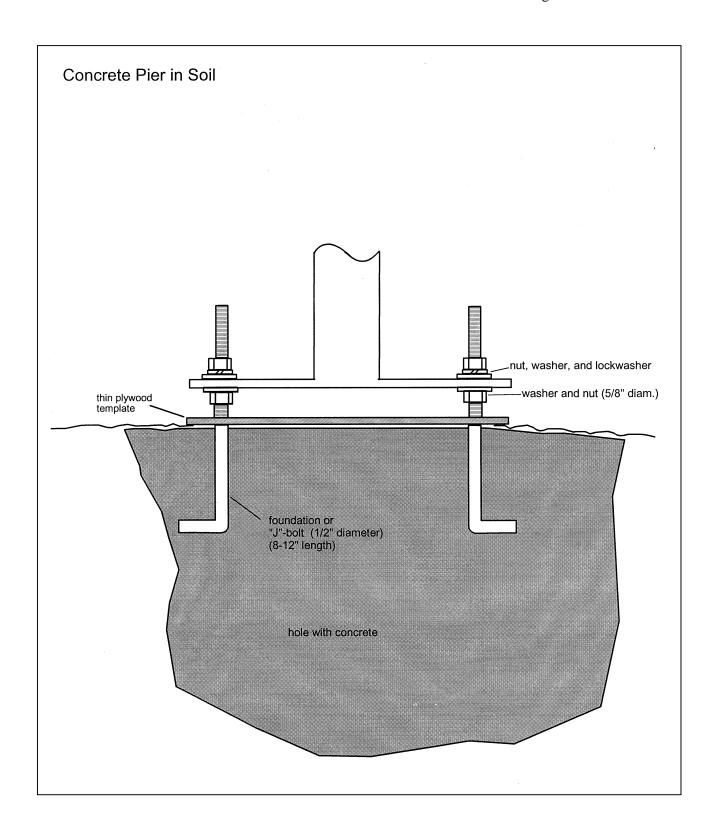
Mounting Post Configuration in Concrete Pier in Soil Surface.
